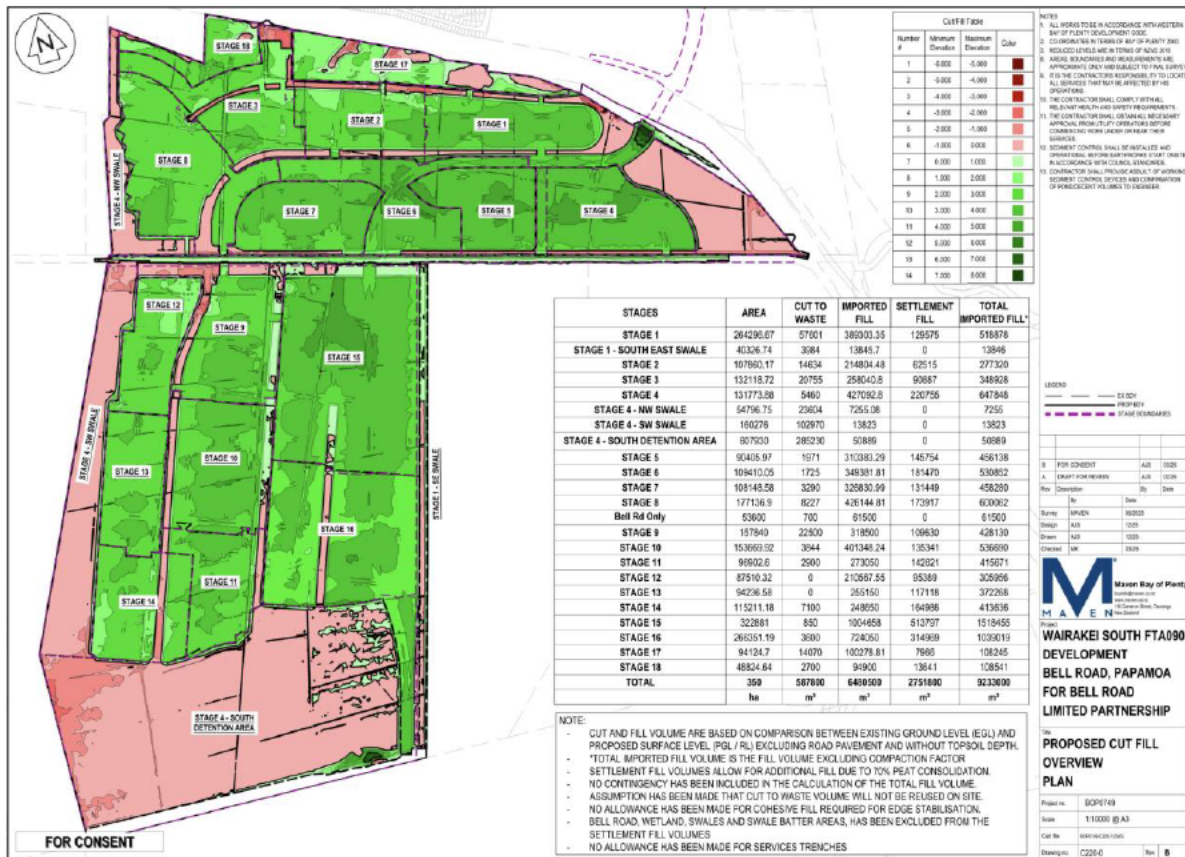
Proposed Cut Fill Overview Plan (Source: Engineering Drawings (Appendix D))
